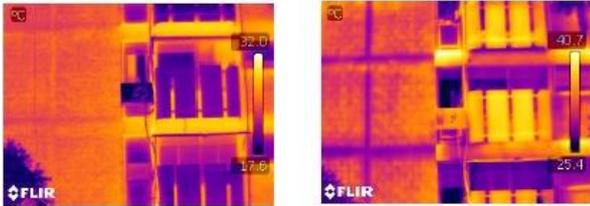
Thermal photo of the Sderot building at 13:00 on a winter day (right) and 19:00(left) before renovation (photo: Wolfgang Motzafi-Haller)
